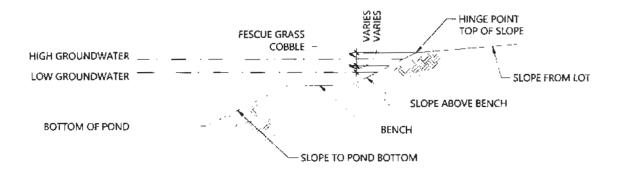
EXHIBIT K. POND WATER LEVEL ILLUSTRATIONS & TYPICAL CROSS-SECTION
